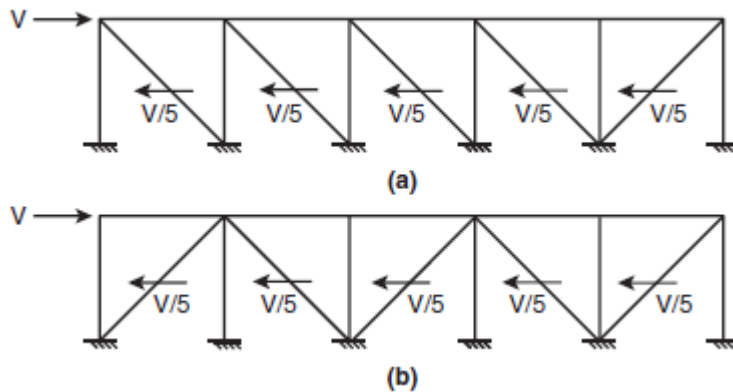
Unacceptable (a) and acceptable (b) brace layouts (adapted from Bruneau 2011, p. 539)
